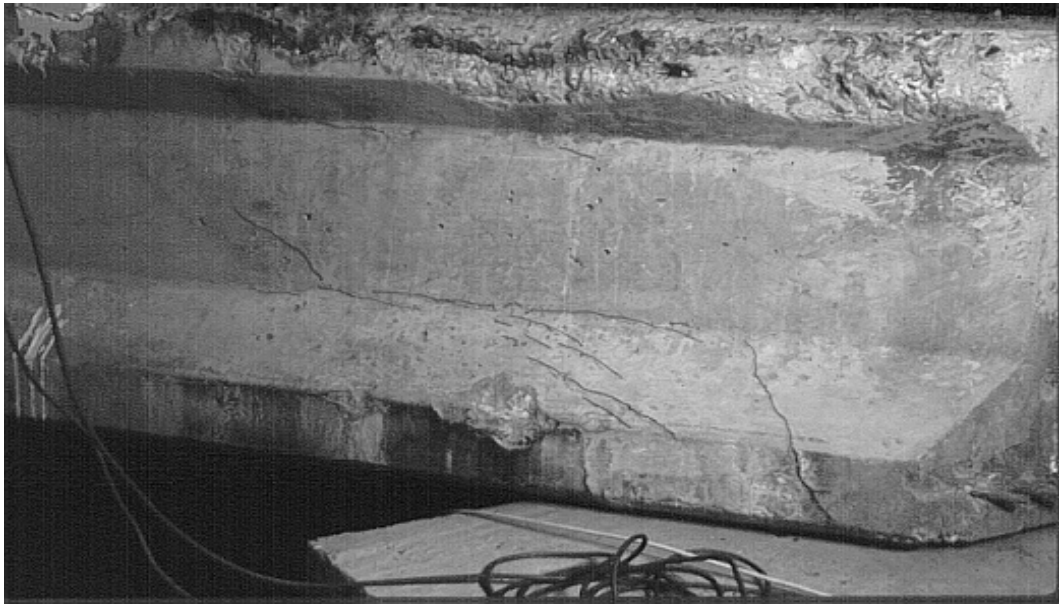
Pretest Cracking of West Face of Box Beam 3 - Test 1
